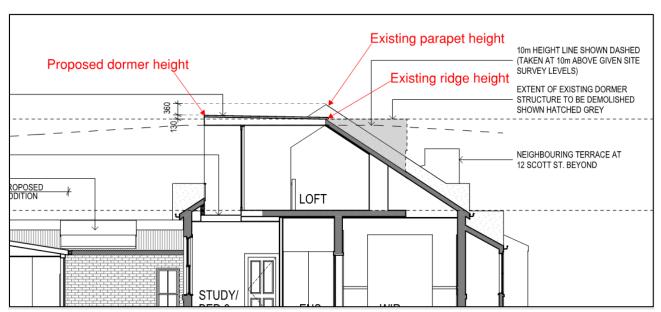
extract of section plan submitted by the applicant demonstrating proposed dormer window height, existing parapet and ridge height.
